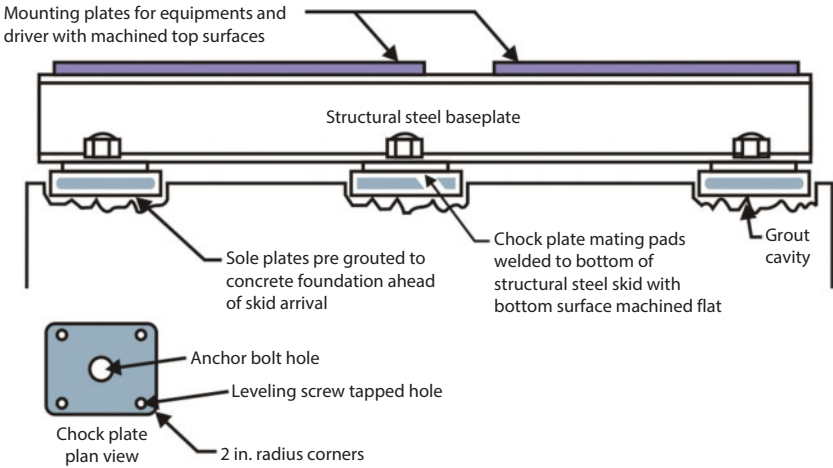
Typical mounting plate arrangement for baseplate mounted equipment. Notice the use of soleplates supporting the structural baseplate. The entire structural steel baseplate will be grouted in place.
